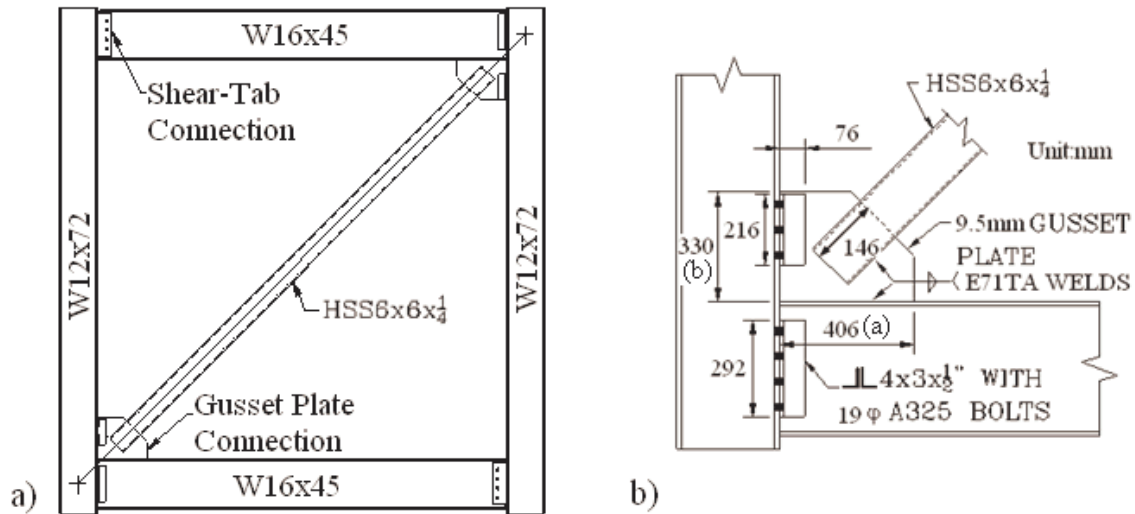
Dimensions of (a) Specimen NCBF32 and (b) the Connection Details
